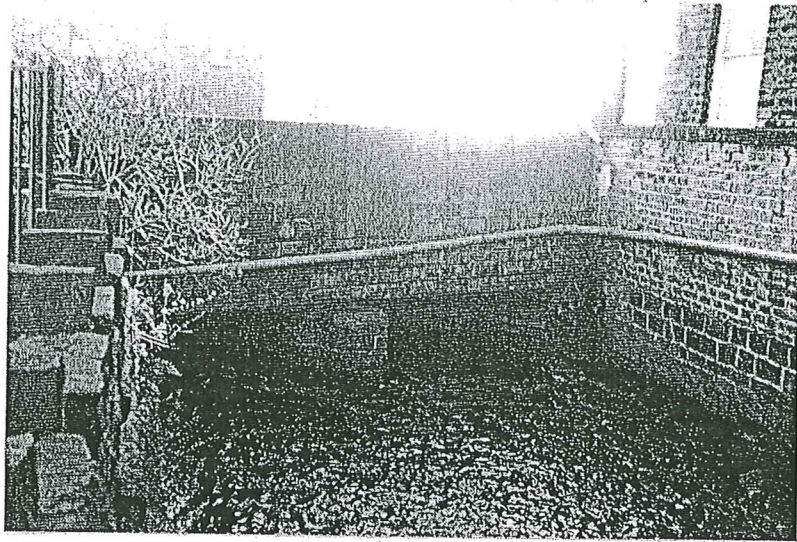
BALME ROAD BRIDGE AND POOL BRIDGE
